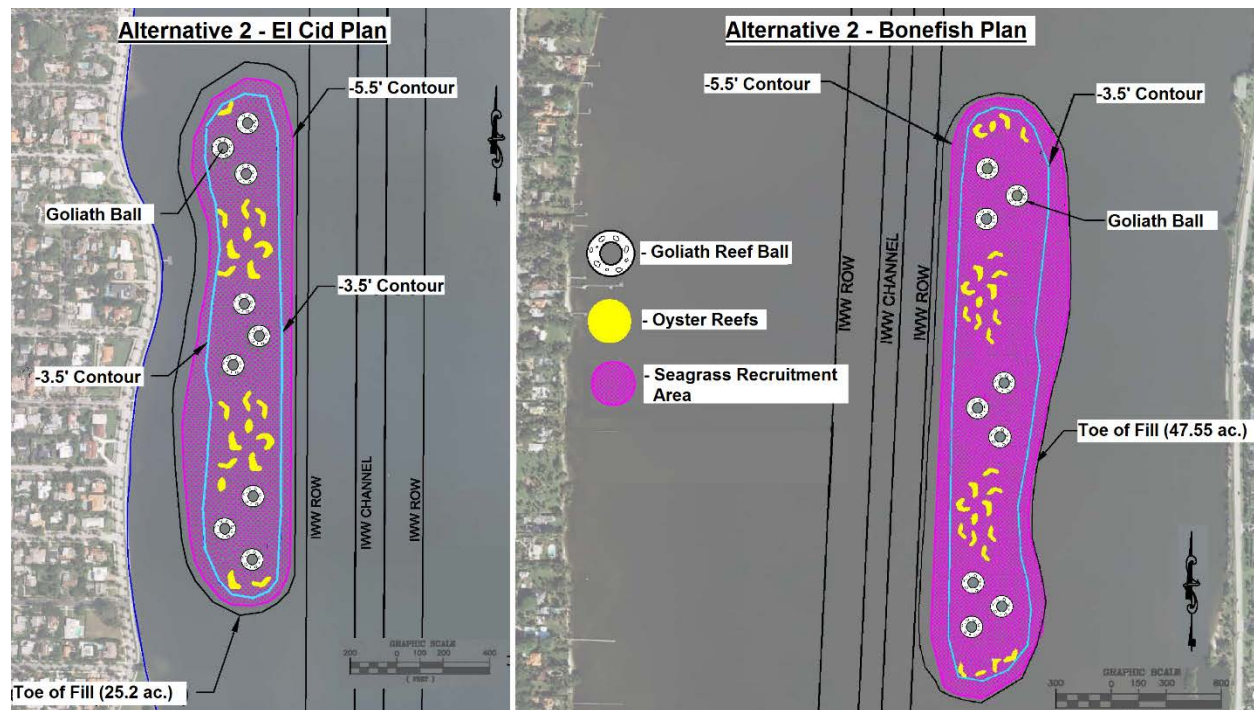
Plan View of Alternative 2 (Sand Capping)
